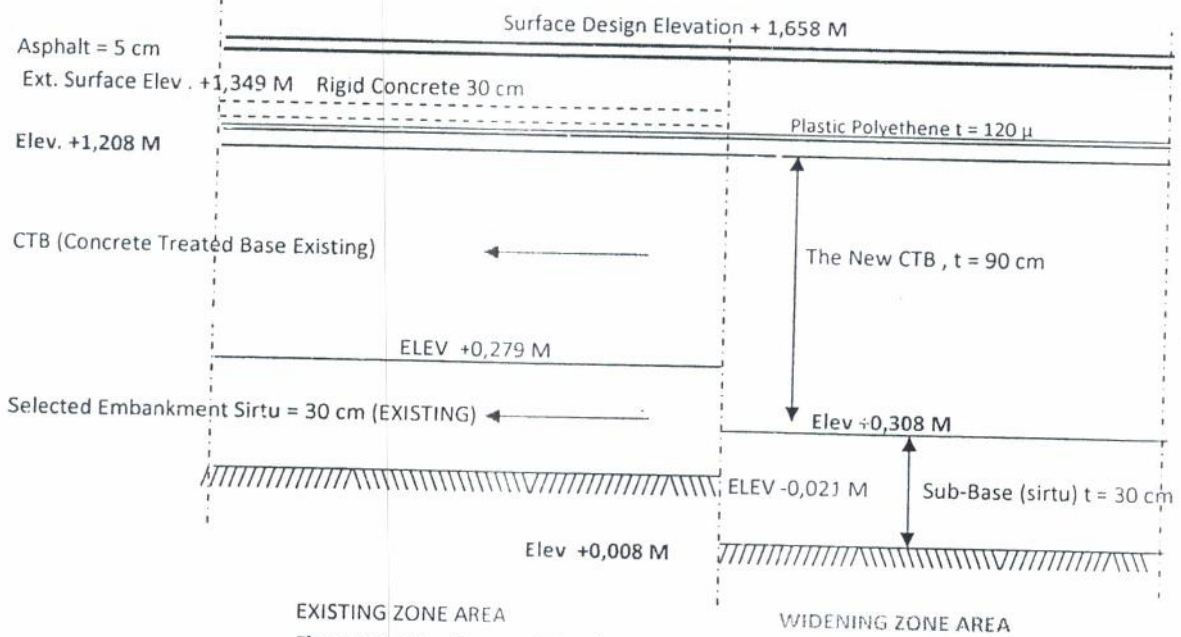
The Proposed Road Construction in STA 8+060 JICT
